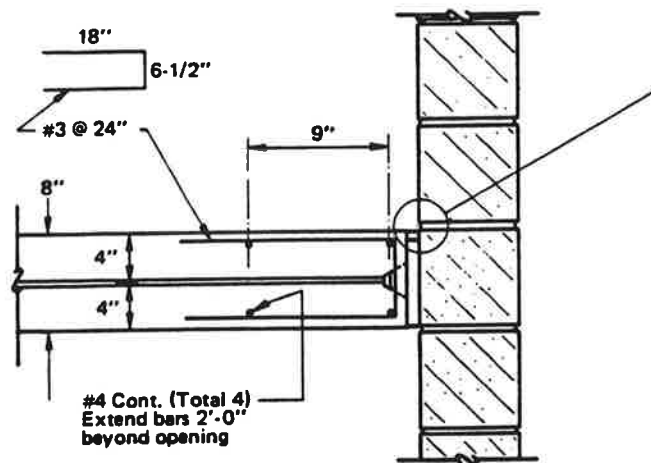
Detail of post-tensioned anchorage zone in slab which is separated from the wall (19).
